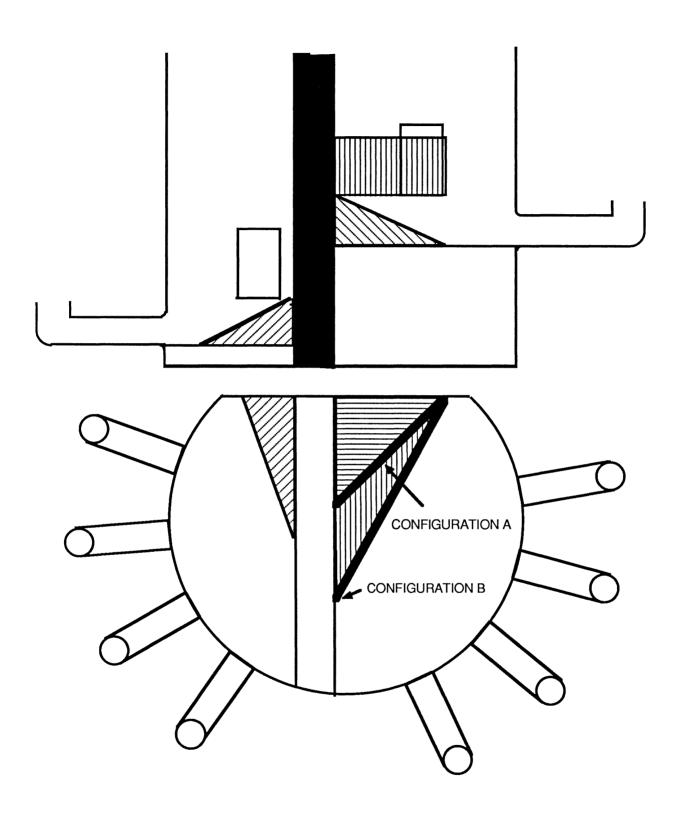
12 Foot High Baffle Wall Configurations in Wet Well 2.
